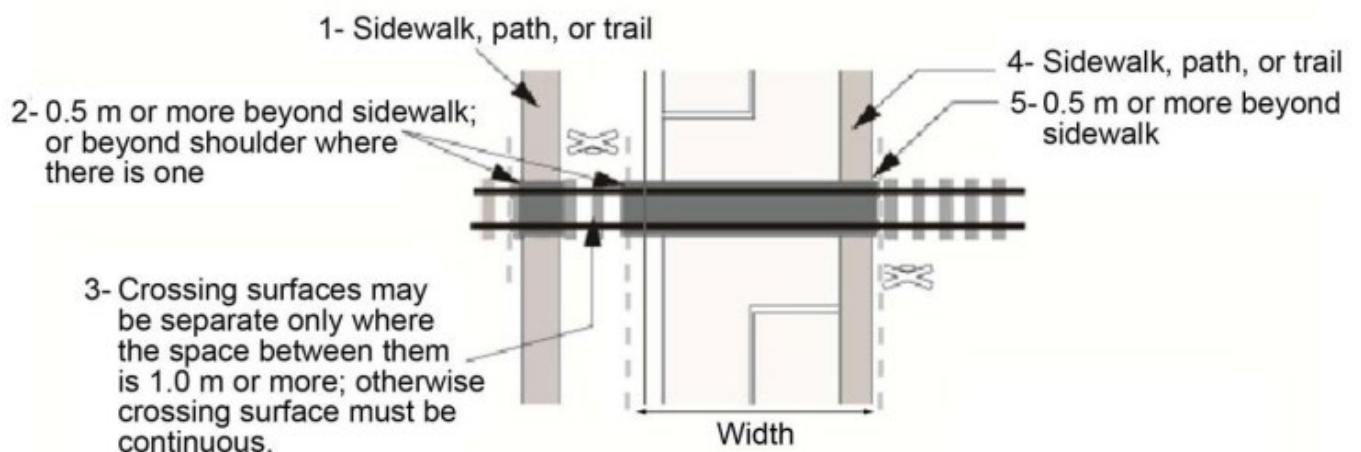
Figure SUB-PART E – 14 – Crossing Surface with a sidewalk, path or trail
